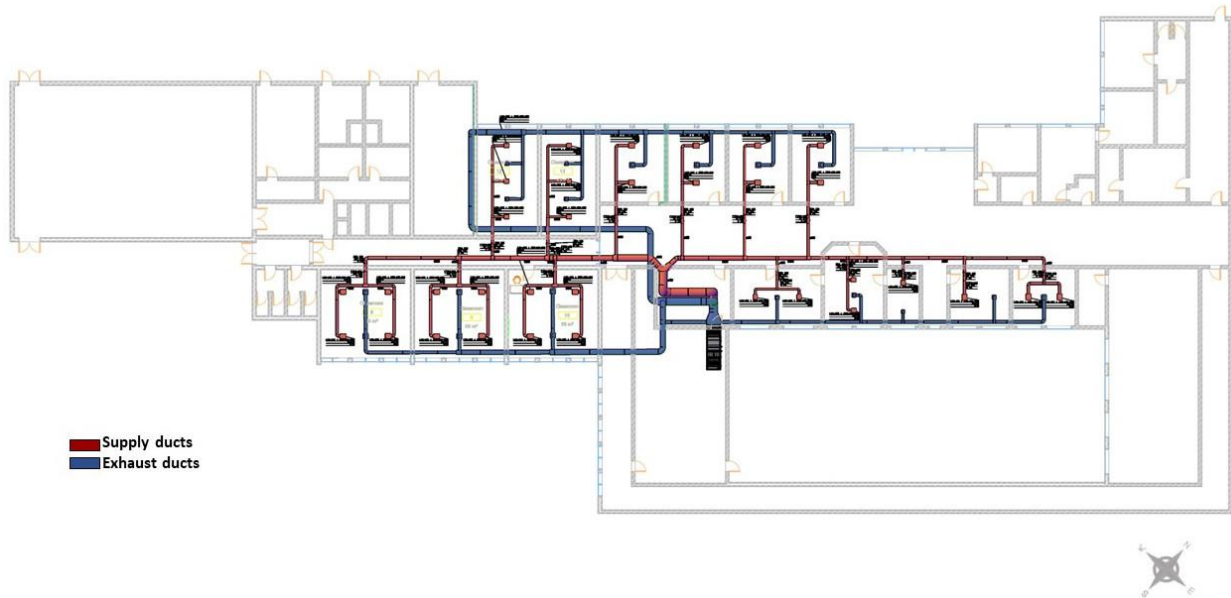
Ventilation layout in school building applying galvanized steel ductwork.
